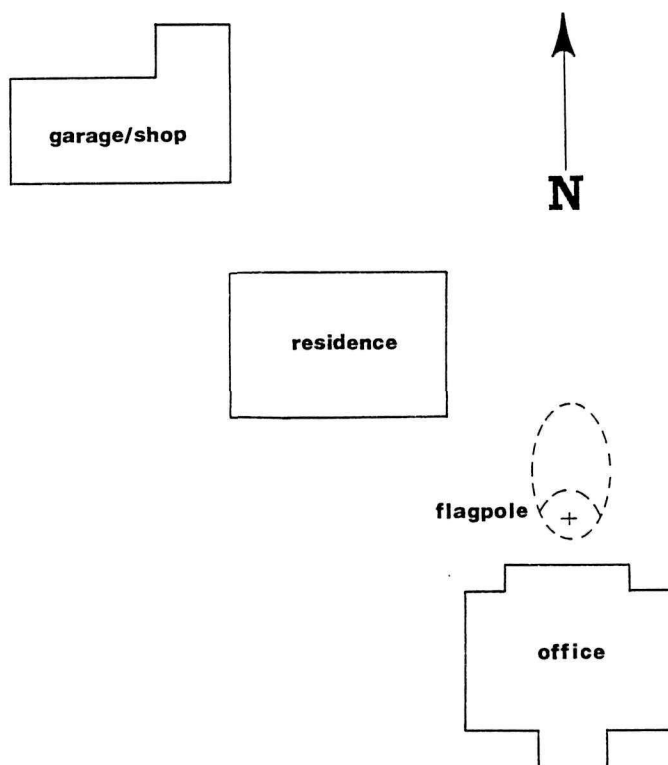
Siteplan sheet of a CCC site inventory form. (Drawing by Kim Lakin, 1982)
